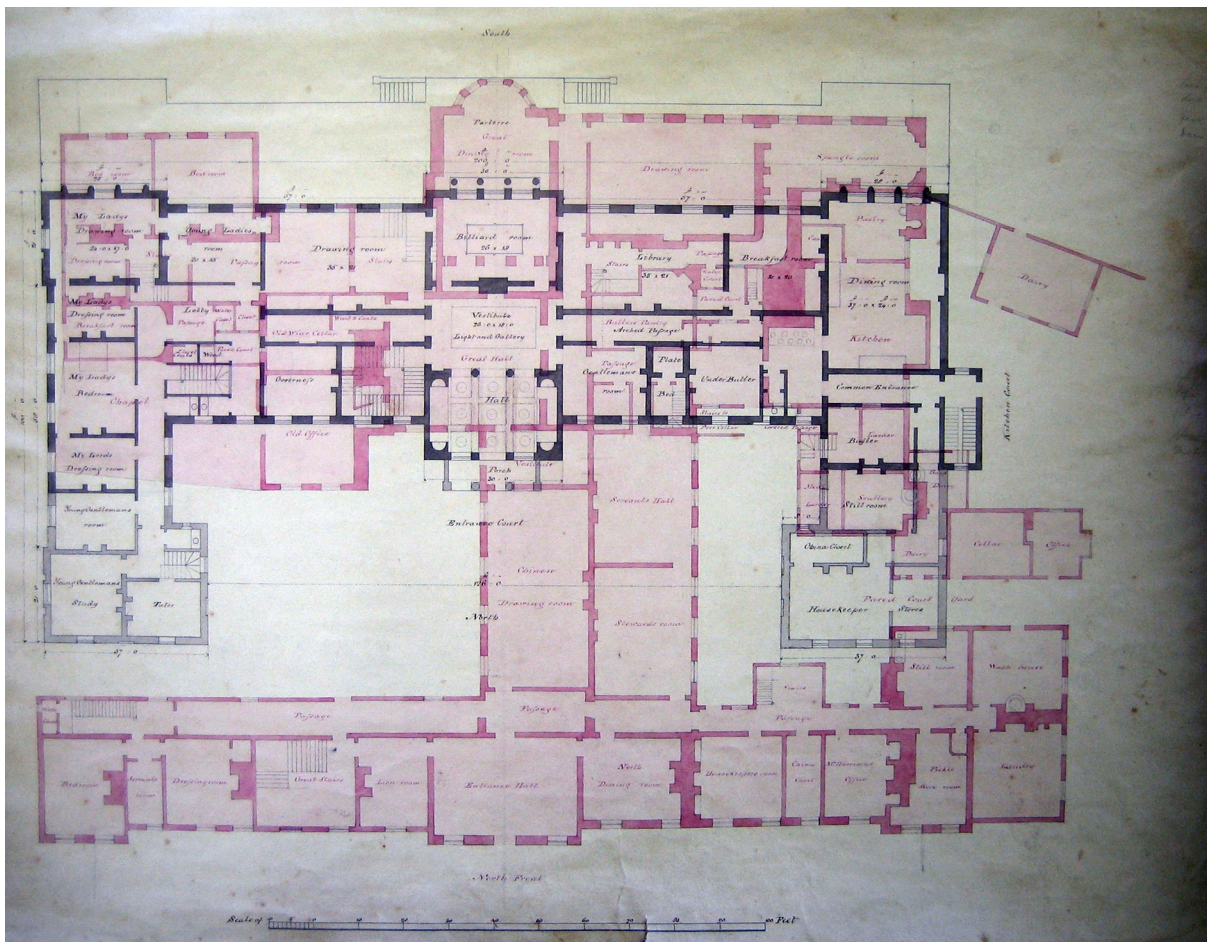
Shaw's plan. 1818. L33/146-147. BARS
